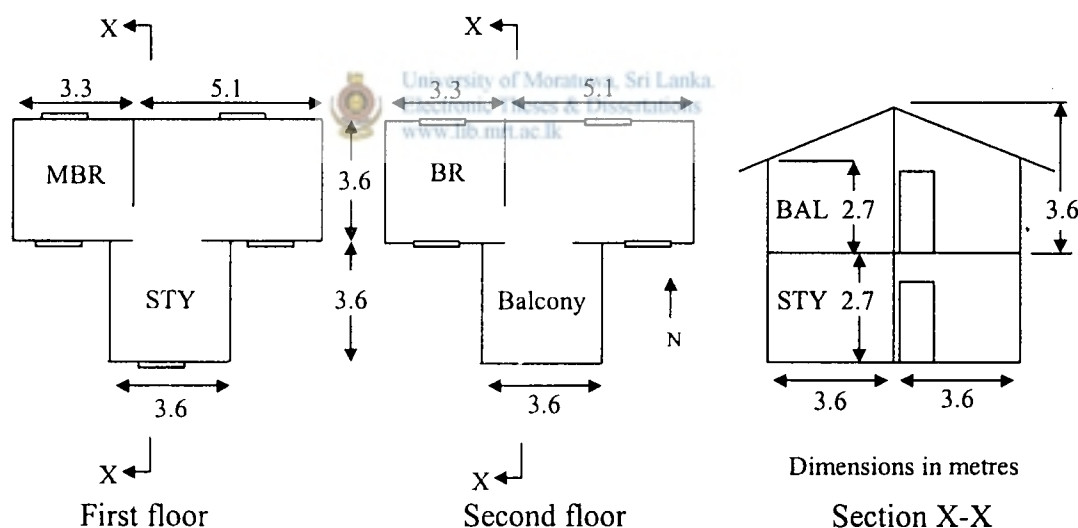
First floor and second floor plans, and Section X-X of the model used for simulations for the house given in Figure 6.13
